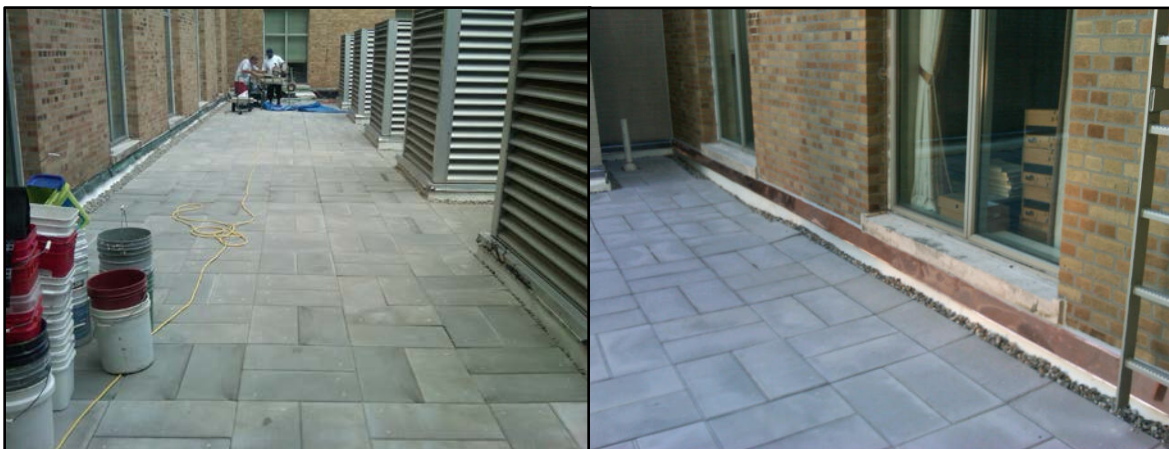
Roof Area to be Replaced at the U.S. Post Office and Courthouse, Camden, New Jersey
